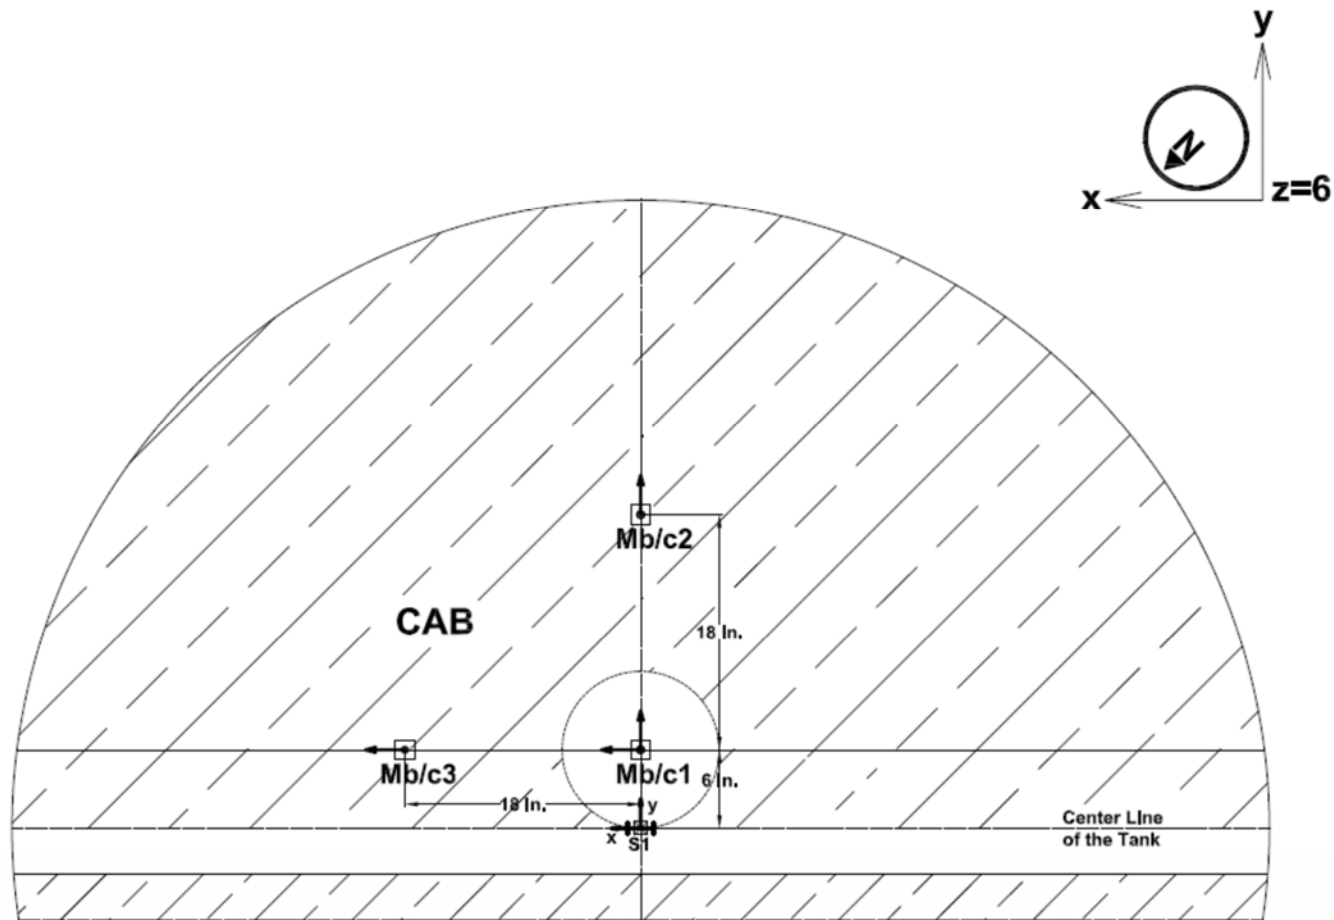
Instrumentation plan for experiment No. 9—Plan view, $Z=6$ inches
